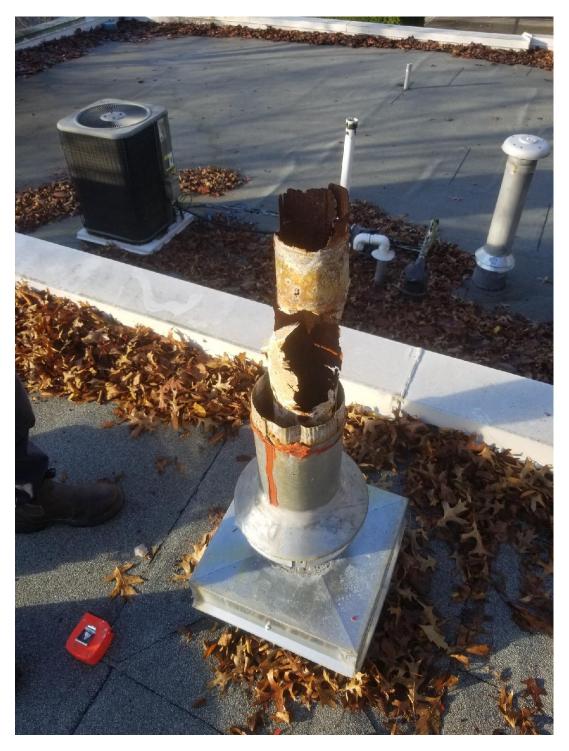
Picture of disassembled concentric termination showing corrosion damage
